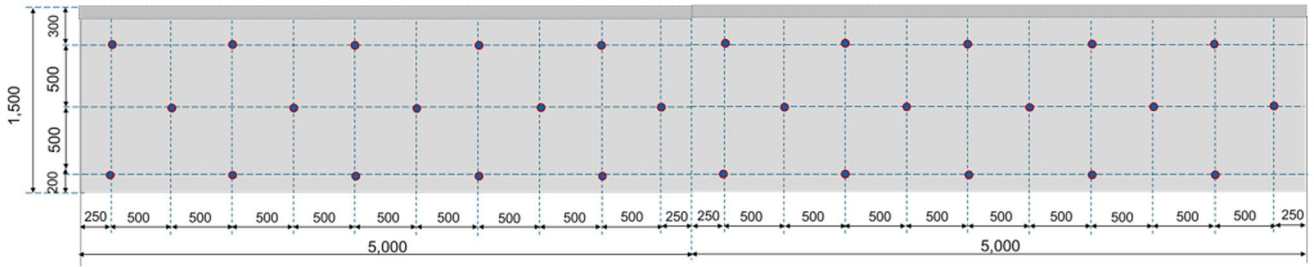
Berm drain, Br 1 (dots show deformed steel bars, D16-L = 30 cm)
